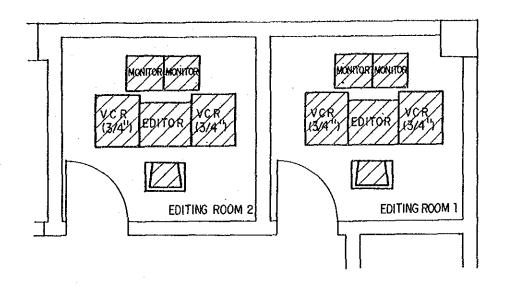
EQUIPMENT LAYOUT OF EDITING ROOM
